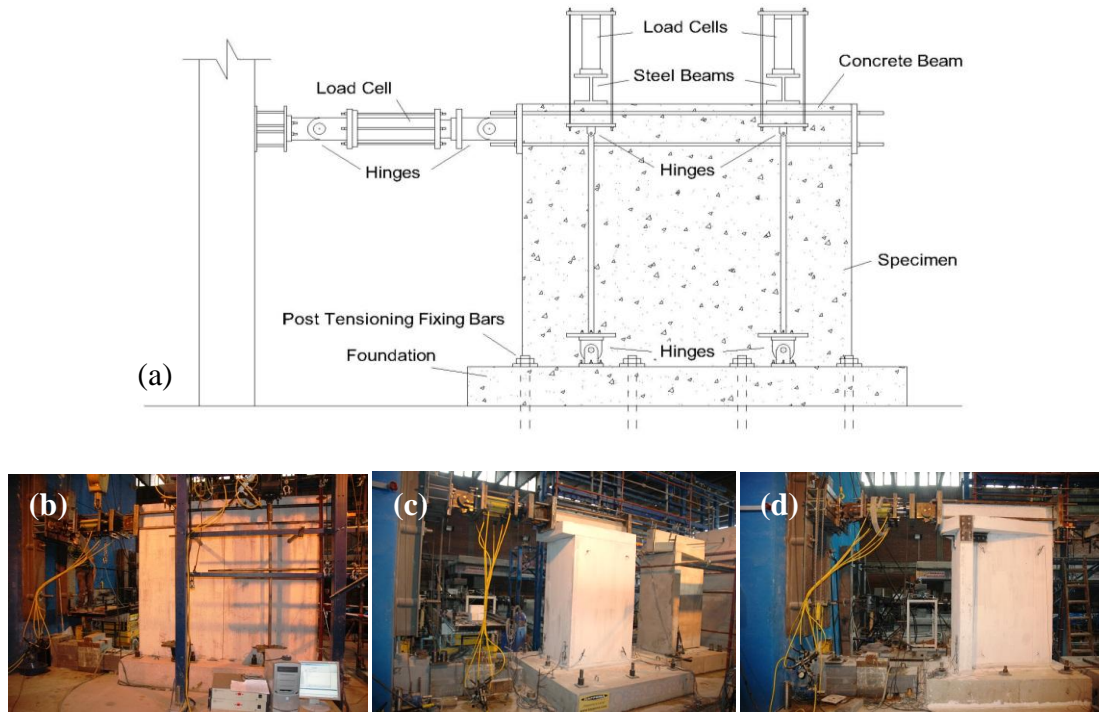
Test Setups; (a) Schematic Details of a Sample Test Setup, (b) Specimens 1 & 2, (c) Specimen 3, (d) Specimen 4
